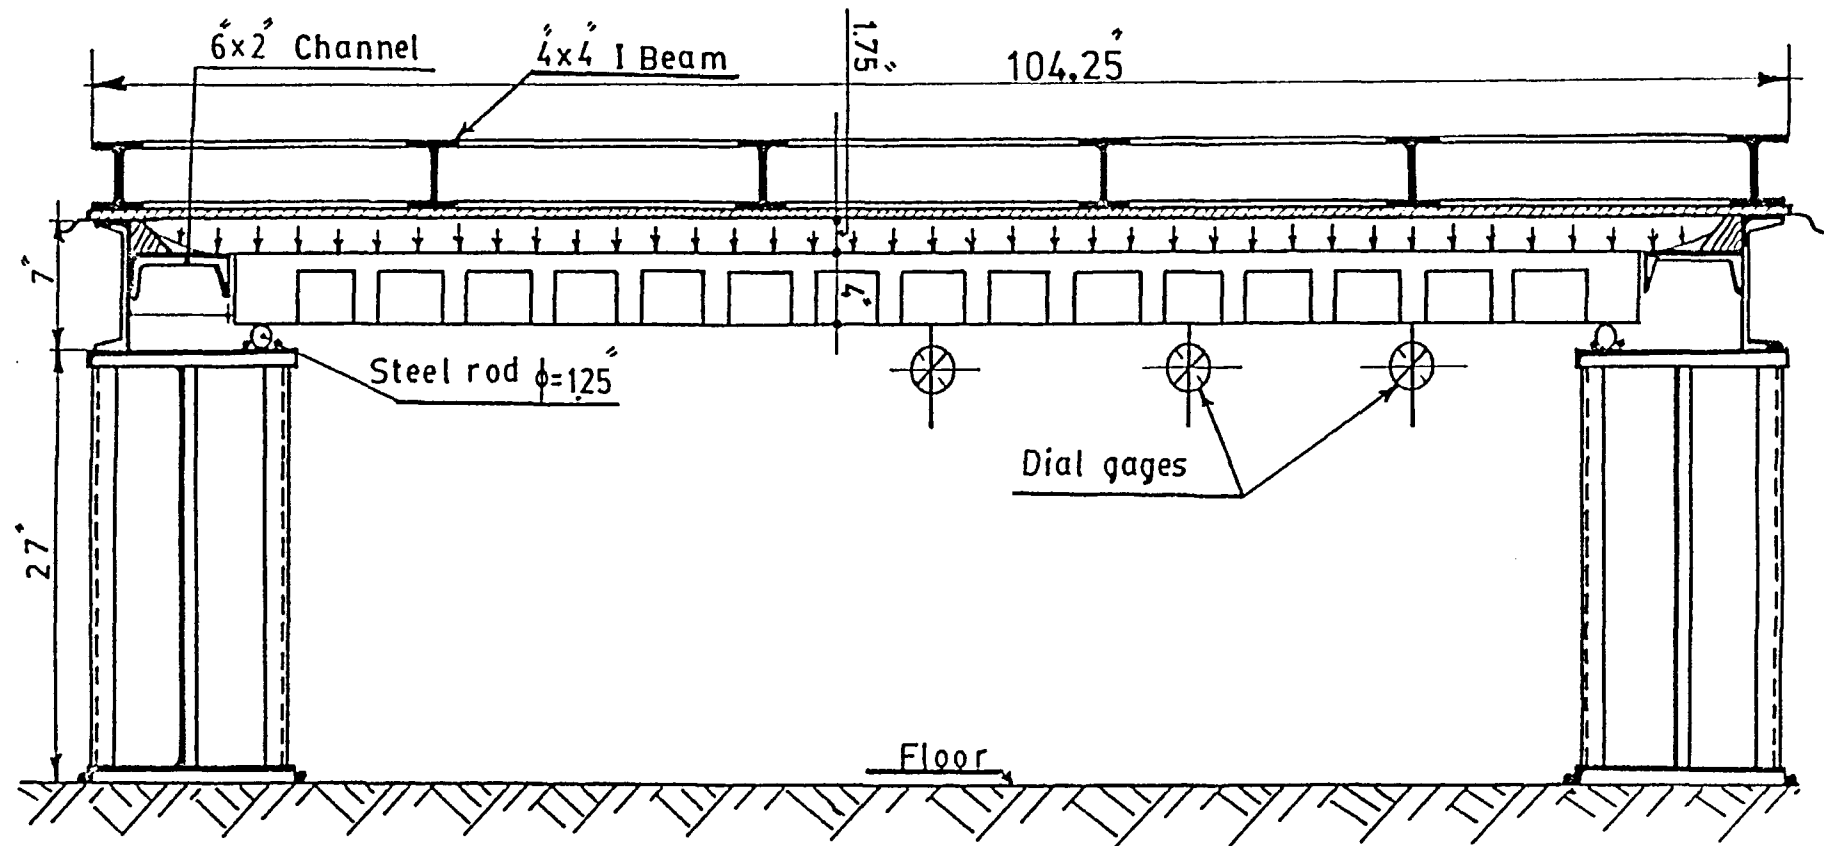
LONGITUDINAL SECTION FOR THE LOADING FRAME.
